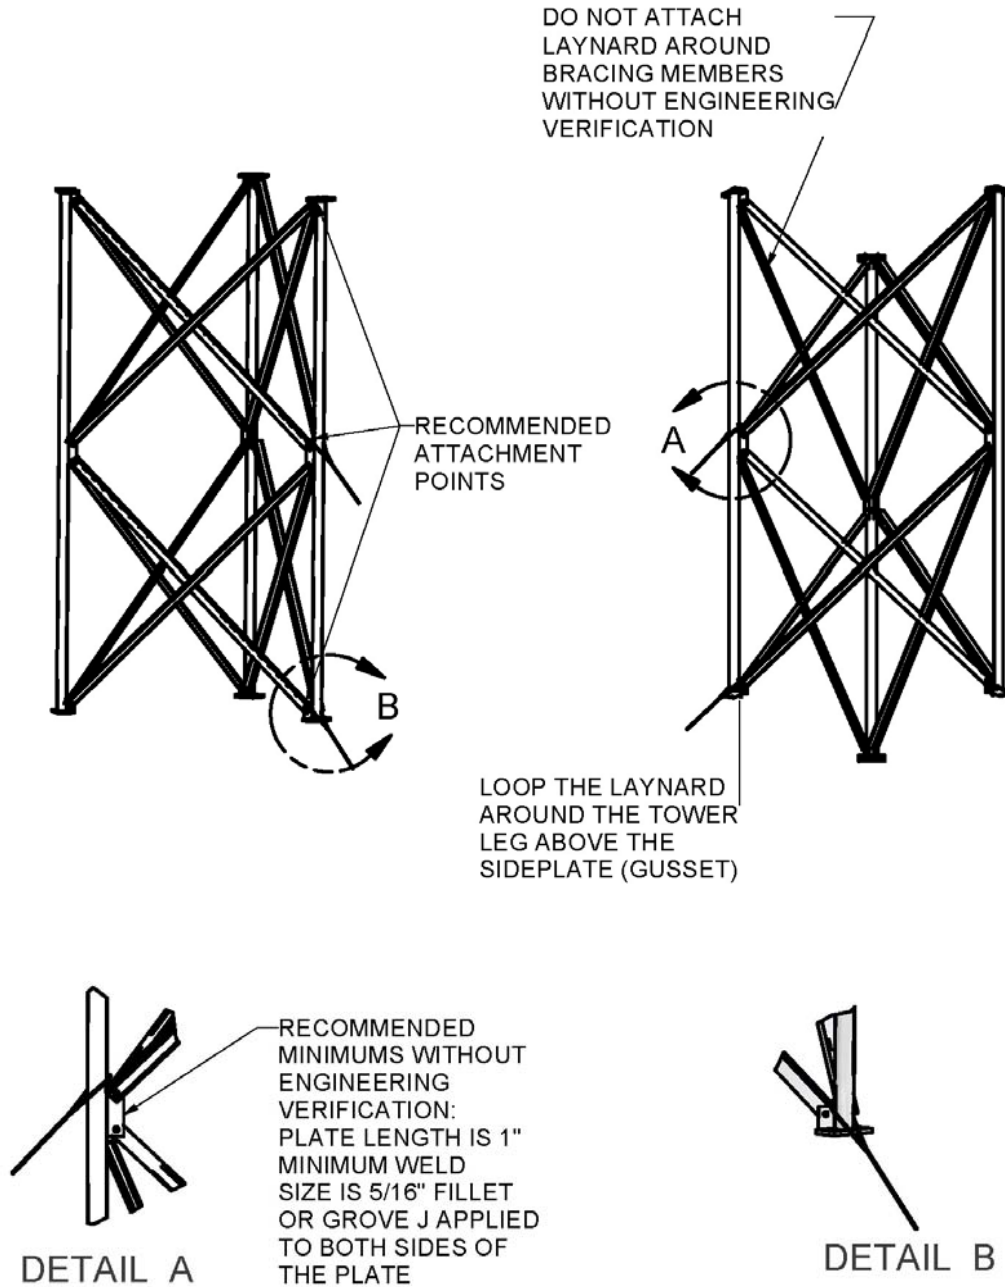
Examples of Climber Attachment Anchorages (Bolted Sections)
